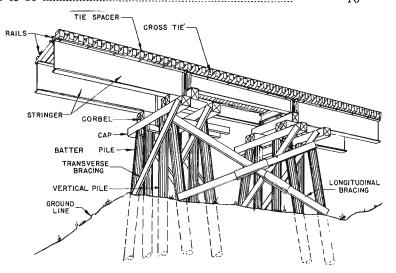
Railway bridge, steel stringers on braced timber pile piers.
